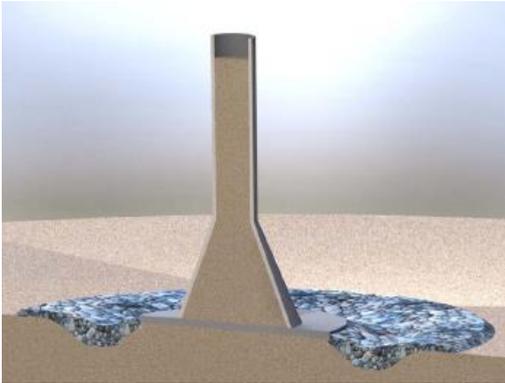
Example on scour protection of a concrete gravity base (drawing: Rambøll).
